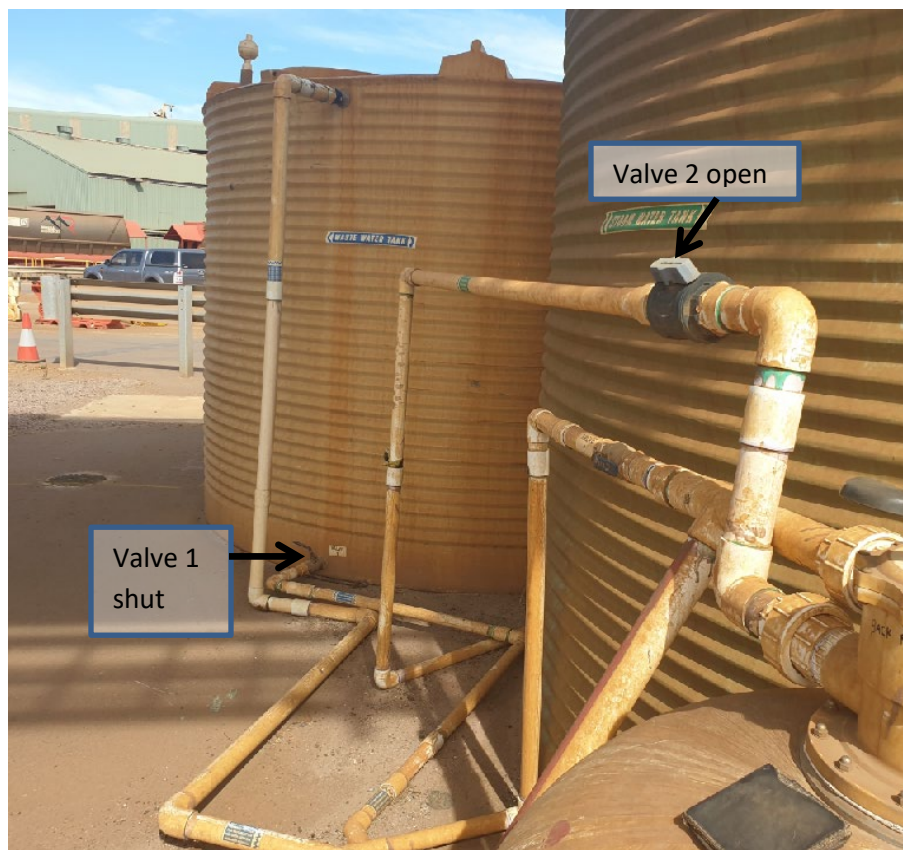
Valves 1 and 2 in position to divert Berth 2 run-off to the empty wastewater tank (seaward tank)
